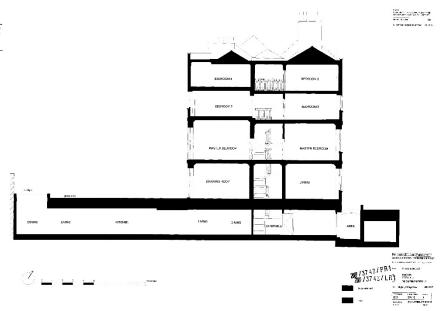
Section of the 21st Century works undertaken in 2008-9
